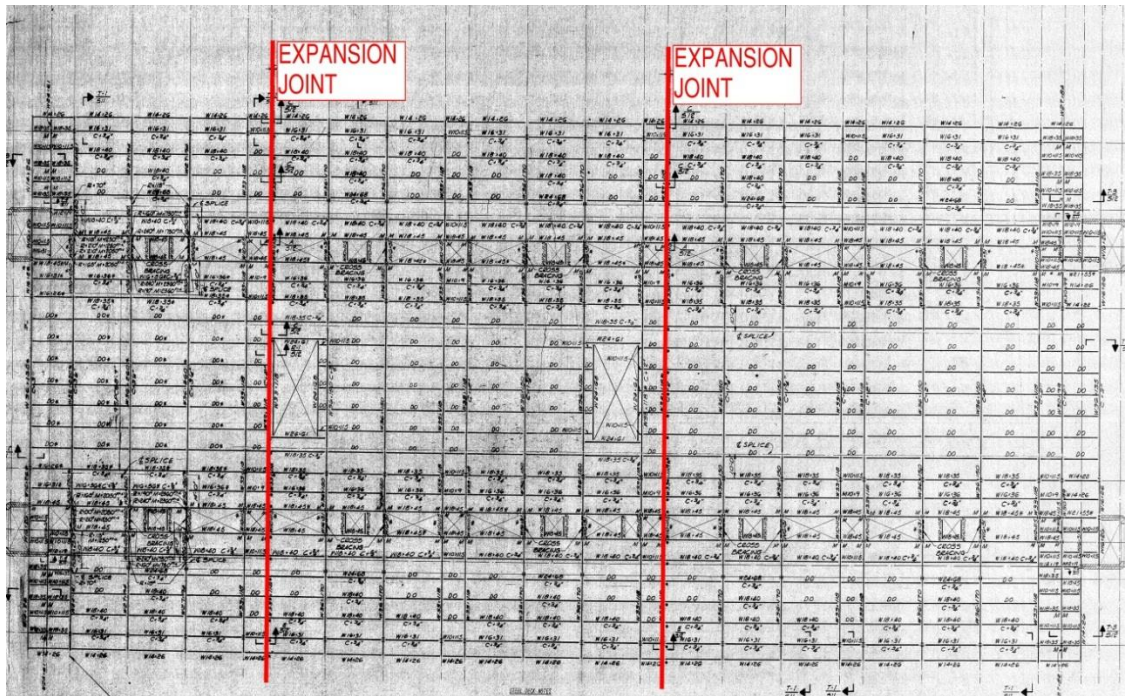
Second Floor Framing Plan (scan of original design drawing)
